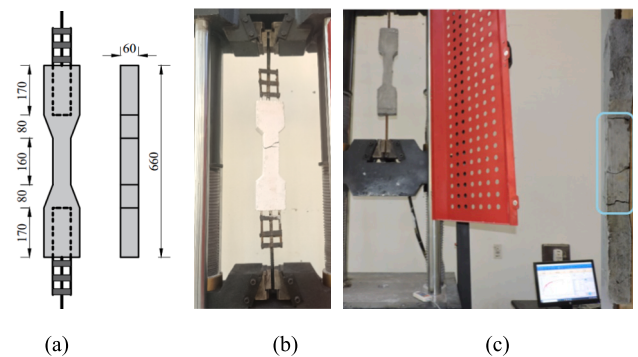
Uniaxial tensile test: (a) Concrete specimen dimensions, (b) cracking of NC, and (c) Cracking of ECC.
